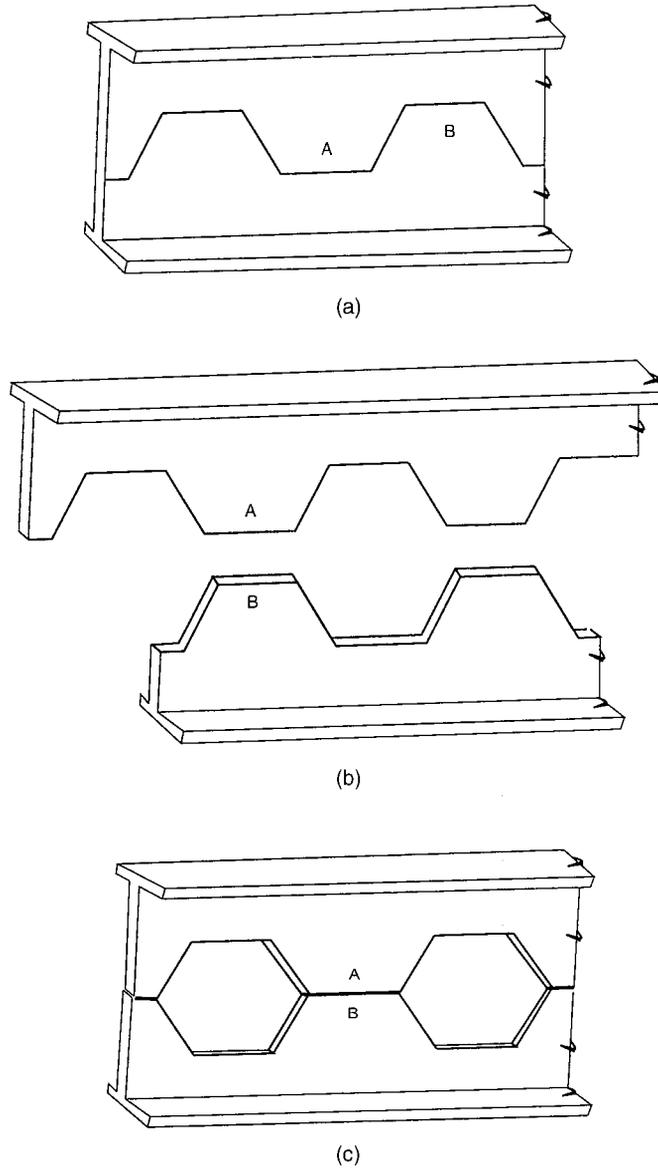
Steps in formation of a castellated beam. (a) Corrugated cut is made longitudinally in a wide-flange beam. (b) Half of the beam is moved longitudinally with respect to the other half and (c) welded to it.
